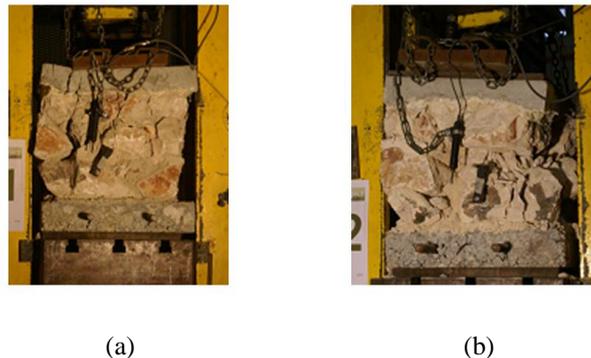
Collapse of masonry specimens: (a) specimen C1 and (b) specimen C2
